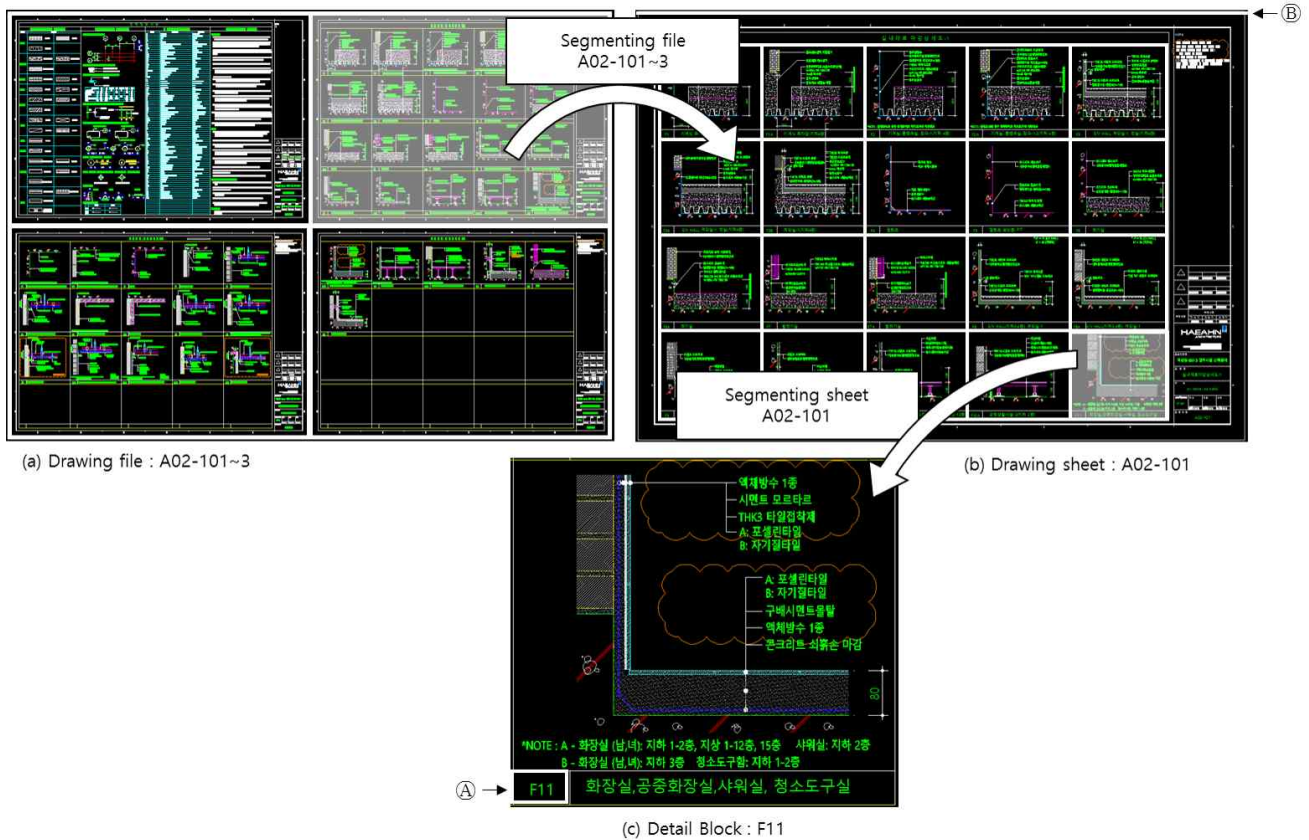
Stepwise process of a segmenting drawing file to detail blocks
